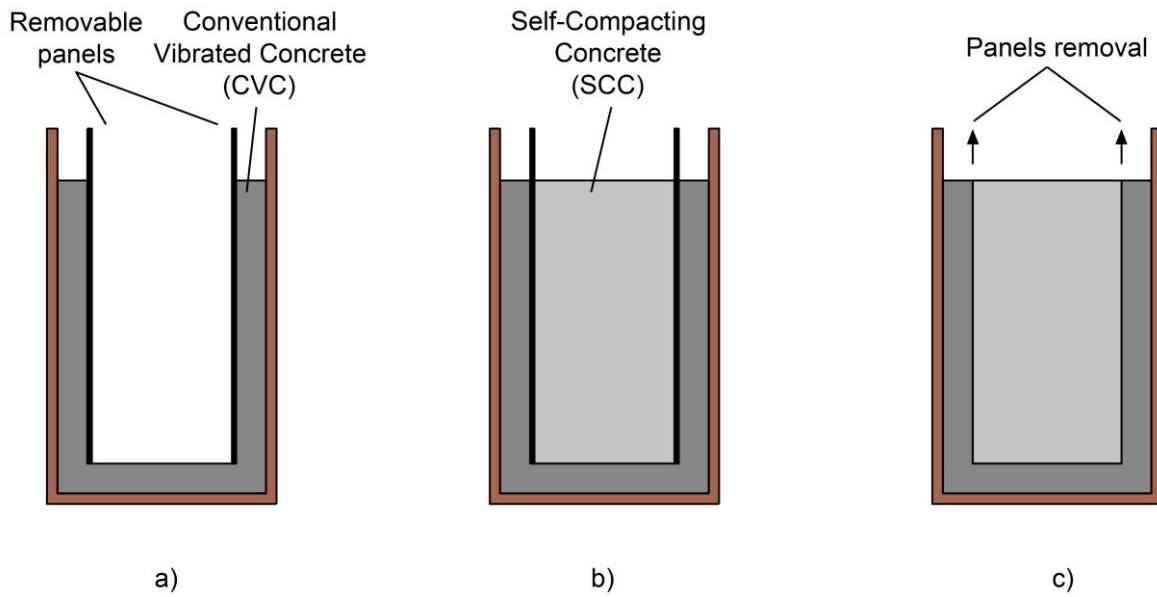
Fresh-on-fresh casting of a composite section composed with a U-shaped external layer: (a) casting and vibration of the external CVC layer with the aid of removable panels, (b) casting of the SCC section core and (c) panels removal.
